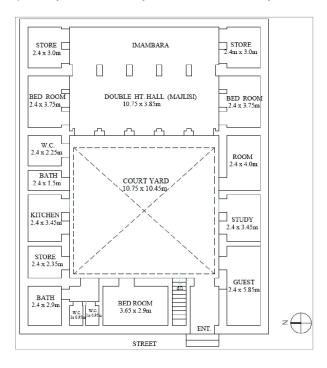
Ground-floor plan of Qaiser Jahan House (Source: the author of the paper)
